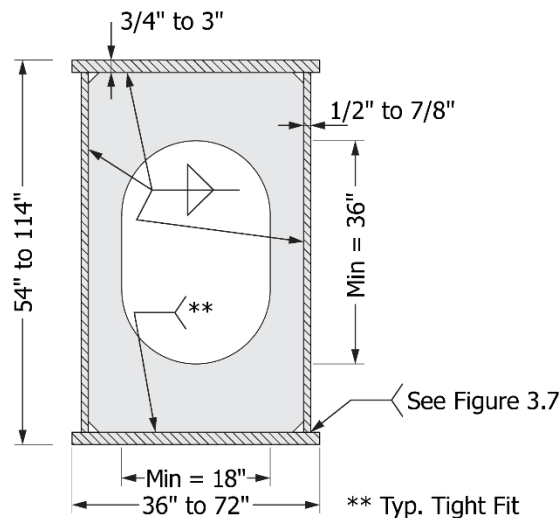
Typical cross-section dimensions for steel box straddle caps based on the bridge survey
